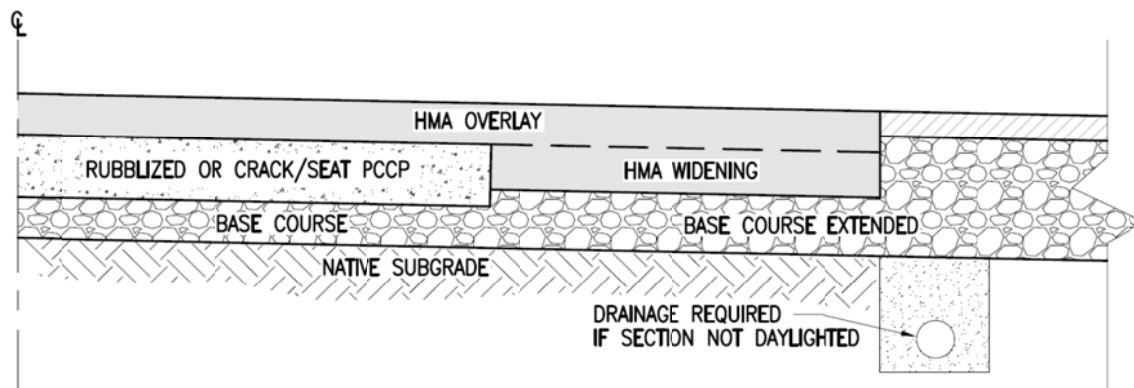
Illustration of widening the shoulder with daylighting or drainage installed.
